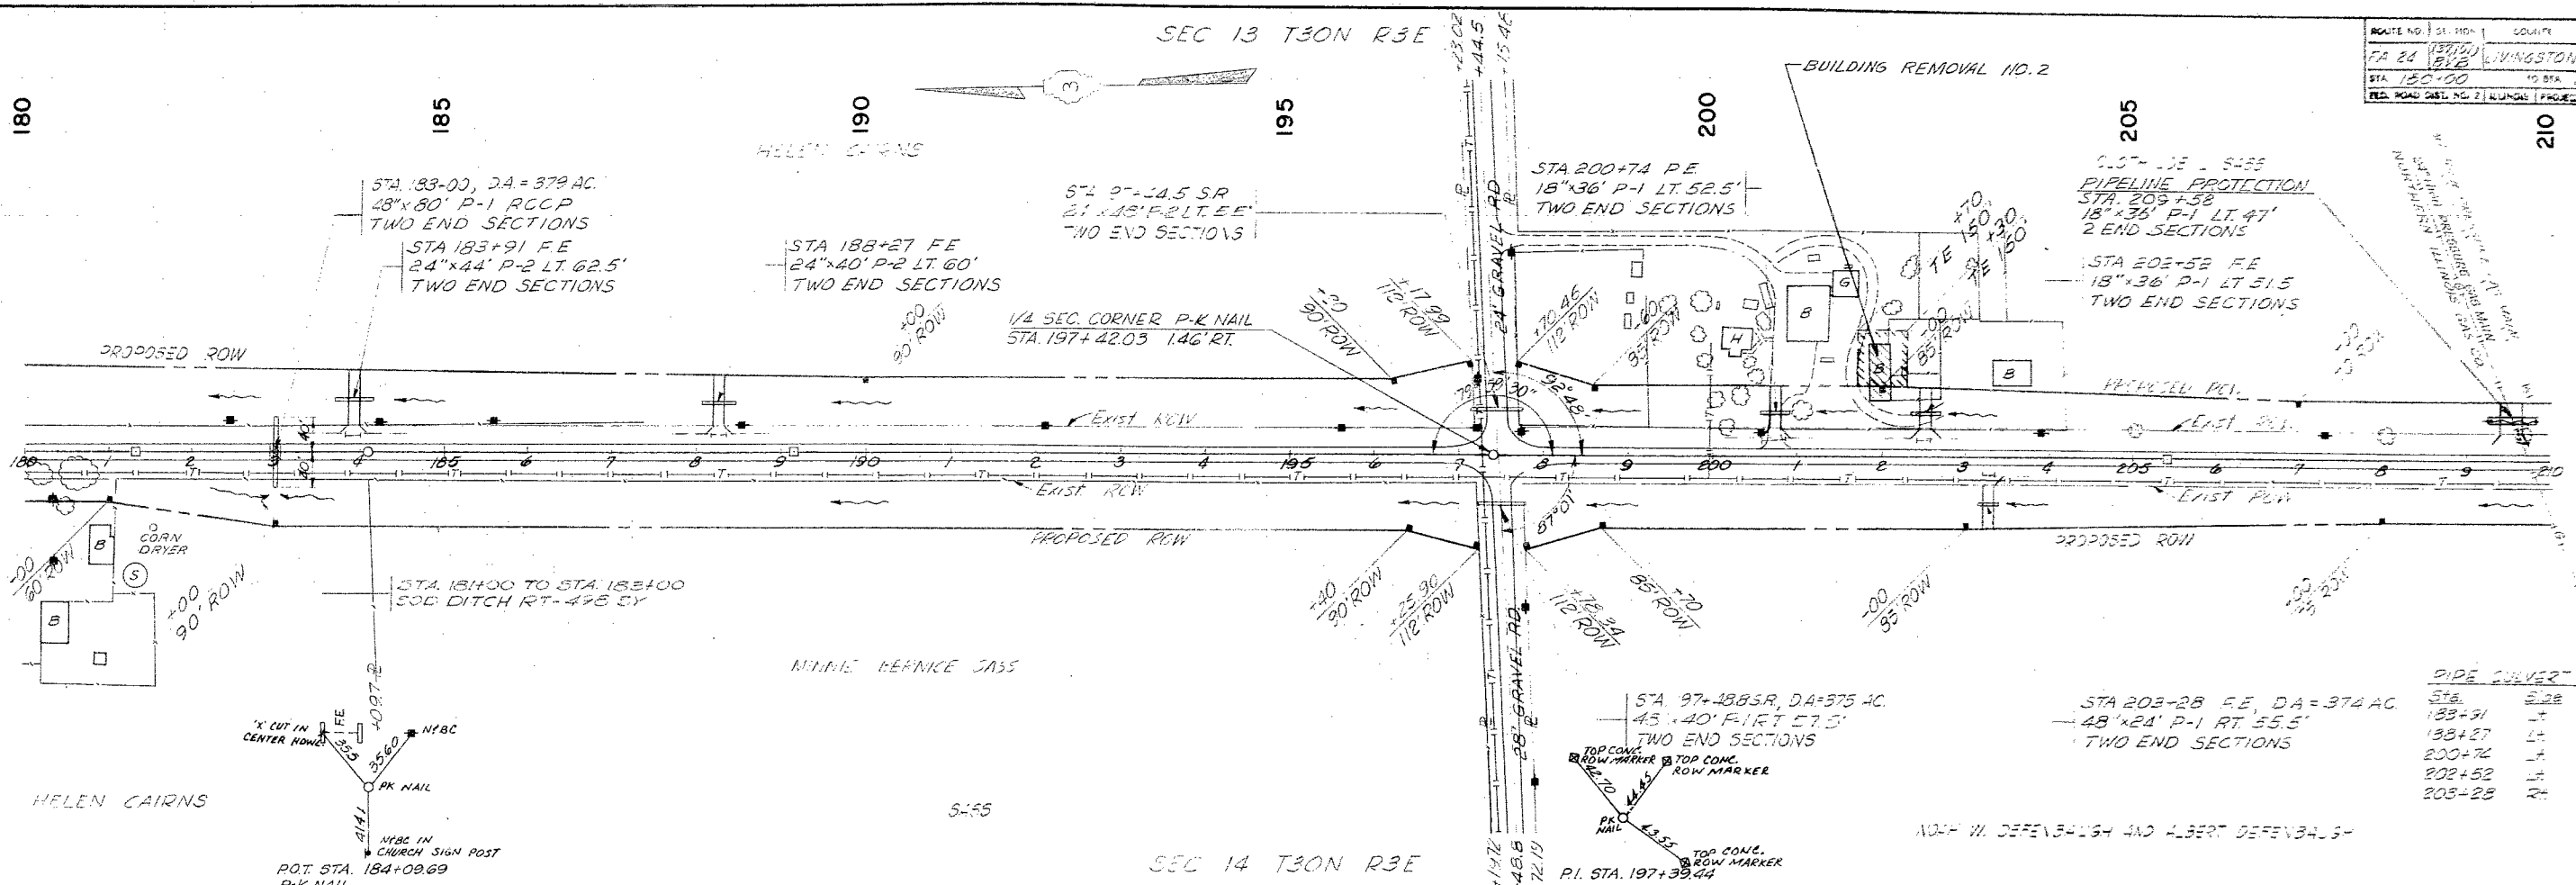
PLAN PROFILE & P. R. STANDARD
